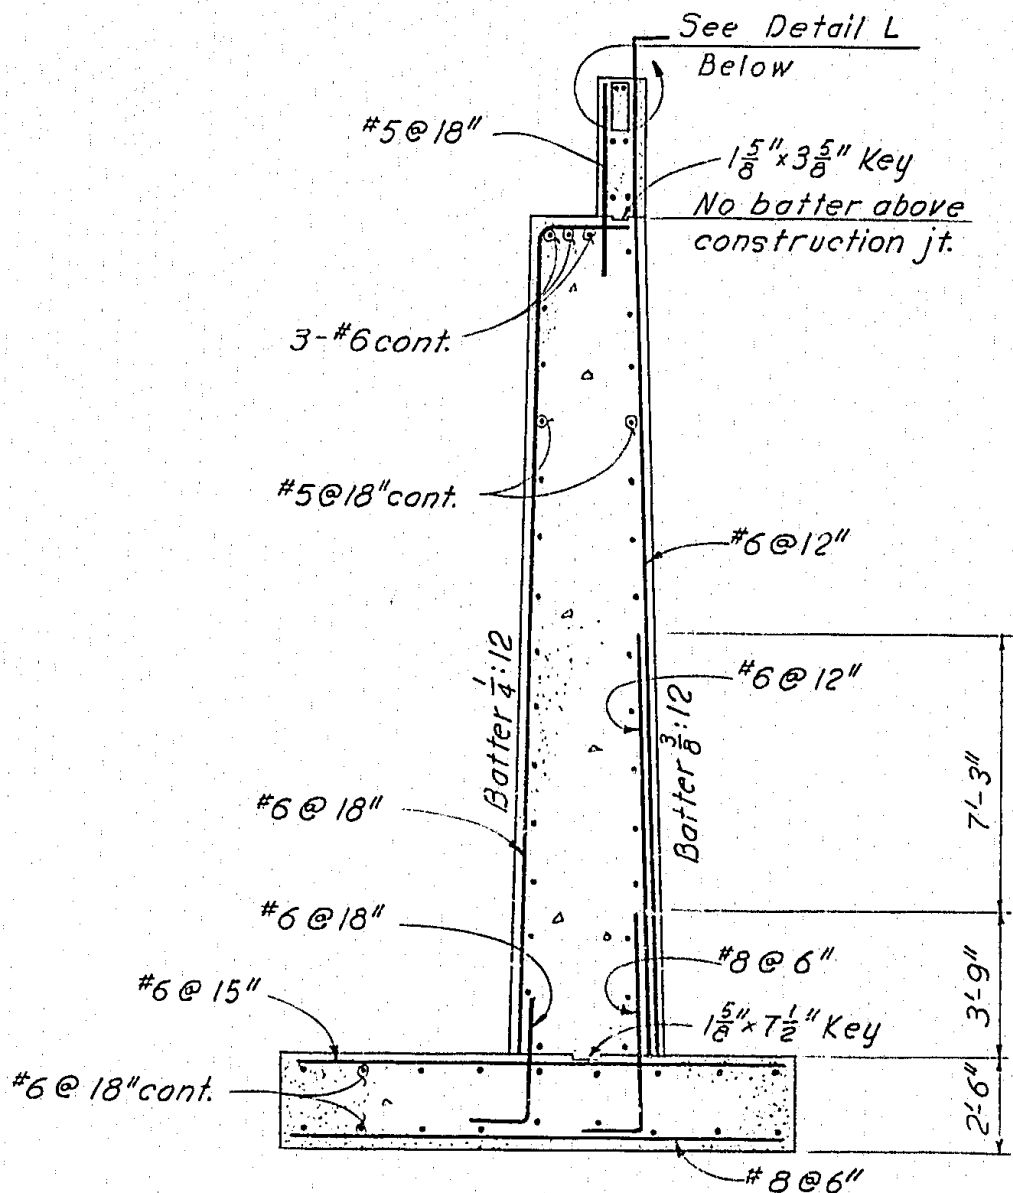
Abutments 1, 2 and 3 to spread footings connection, inadequate reinforcing embedment length
